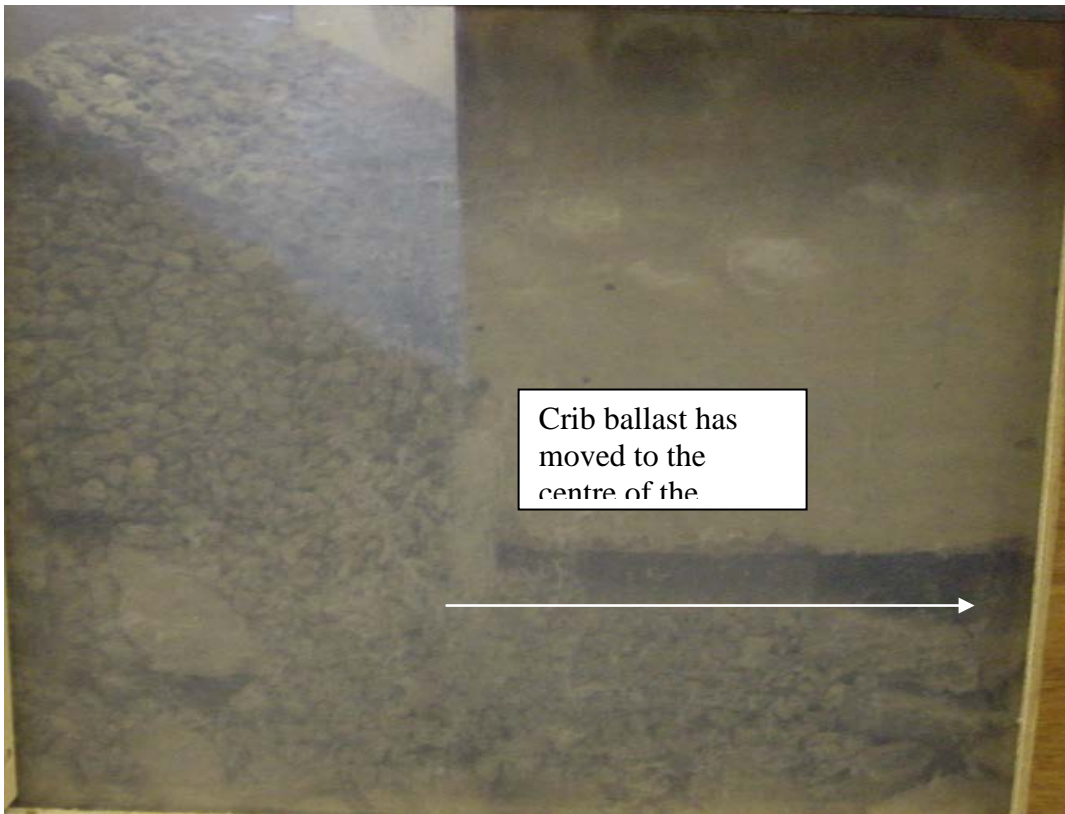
Photograph showing movement of 5mm crib ballast to the centre of the sleeper cross-section.
